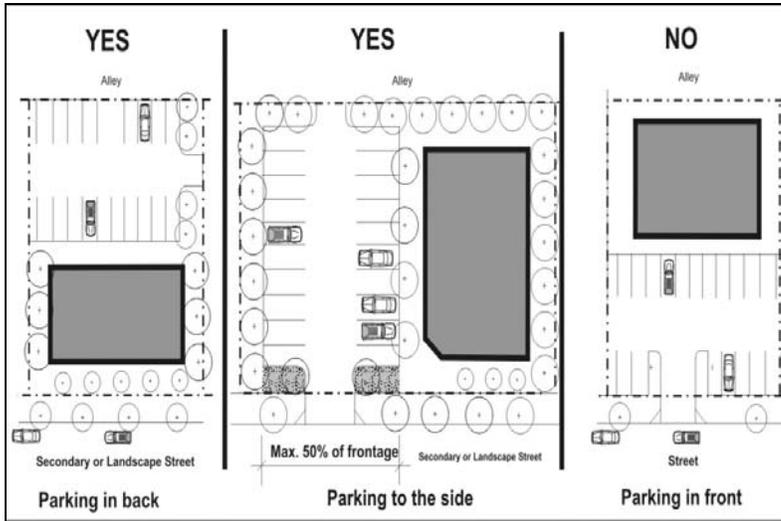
Parking location requirements for Secondary and Landscaped Streets.
